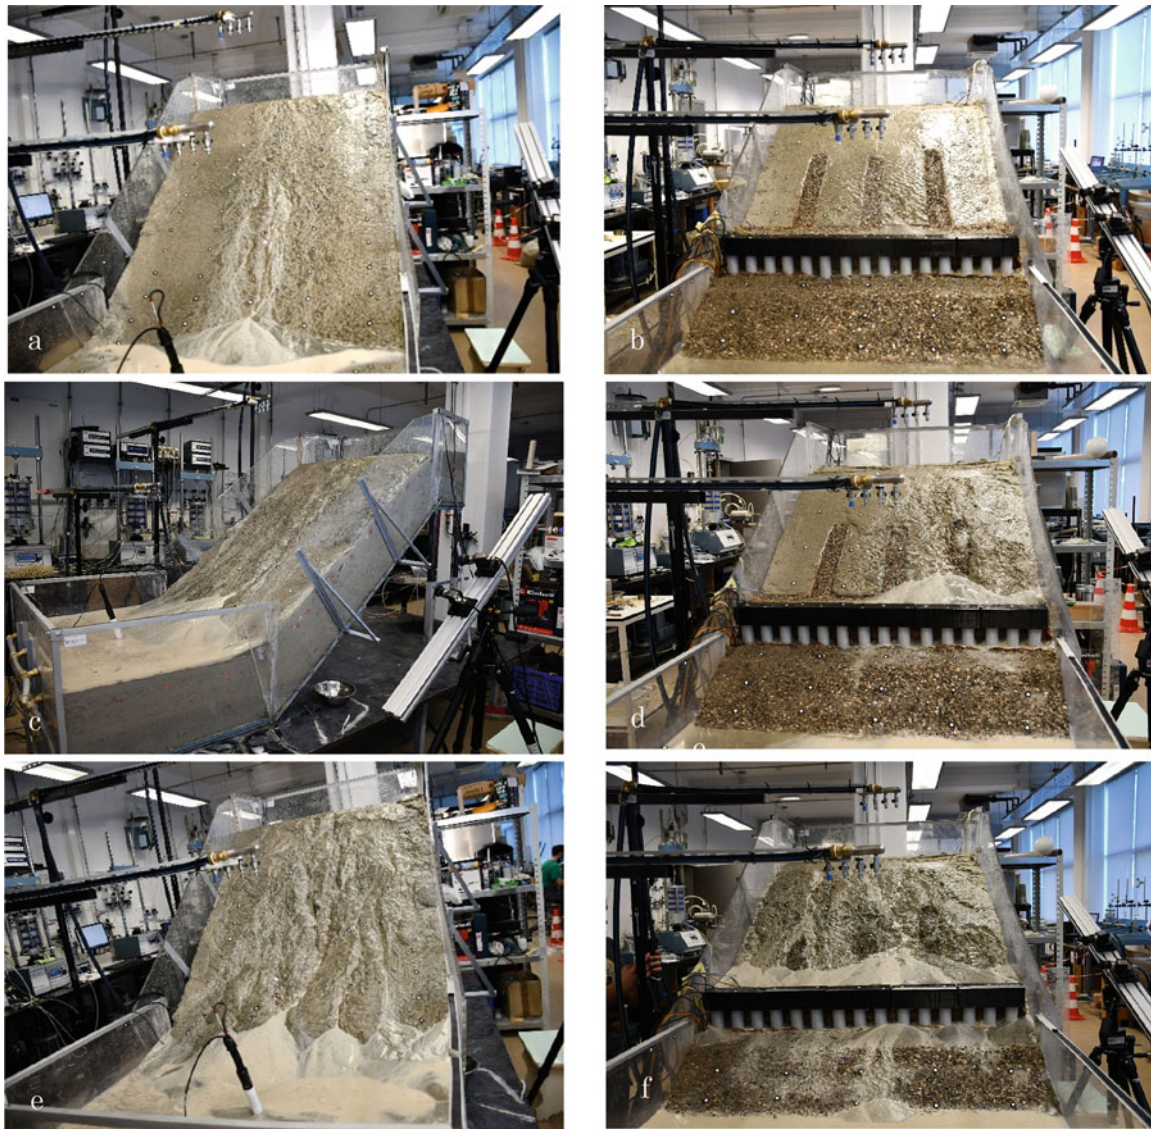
Development of landslides in small-scale clayey slope without and with installed pile wall: (a) erosion process after initial instability in the unsupported slope (85 min), (b) slope after the first cracks in slope with pile wall (107 min), (c) development of erosion process on
